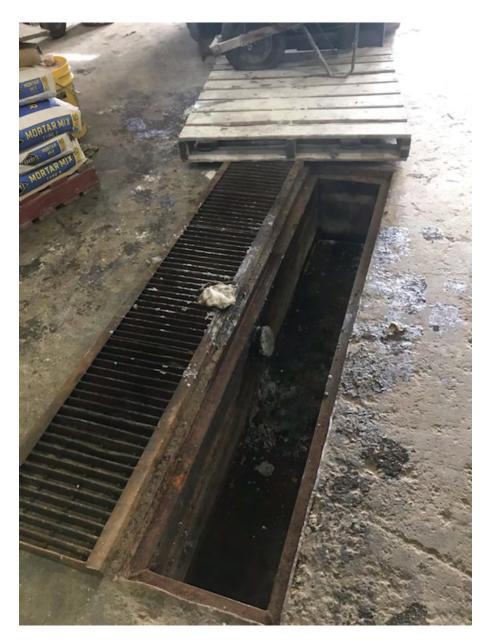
Bentonite slurry was pumped to completely fill piping between floor sump and oil/water separator's previous location (this photo shows piping exiting sump full of bentonite)
